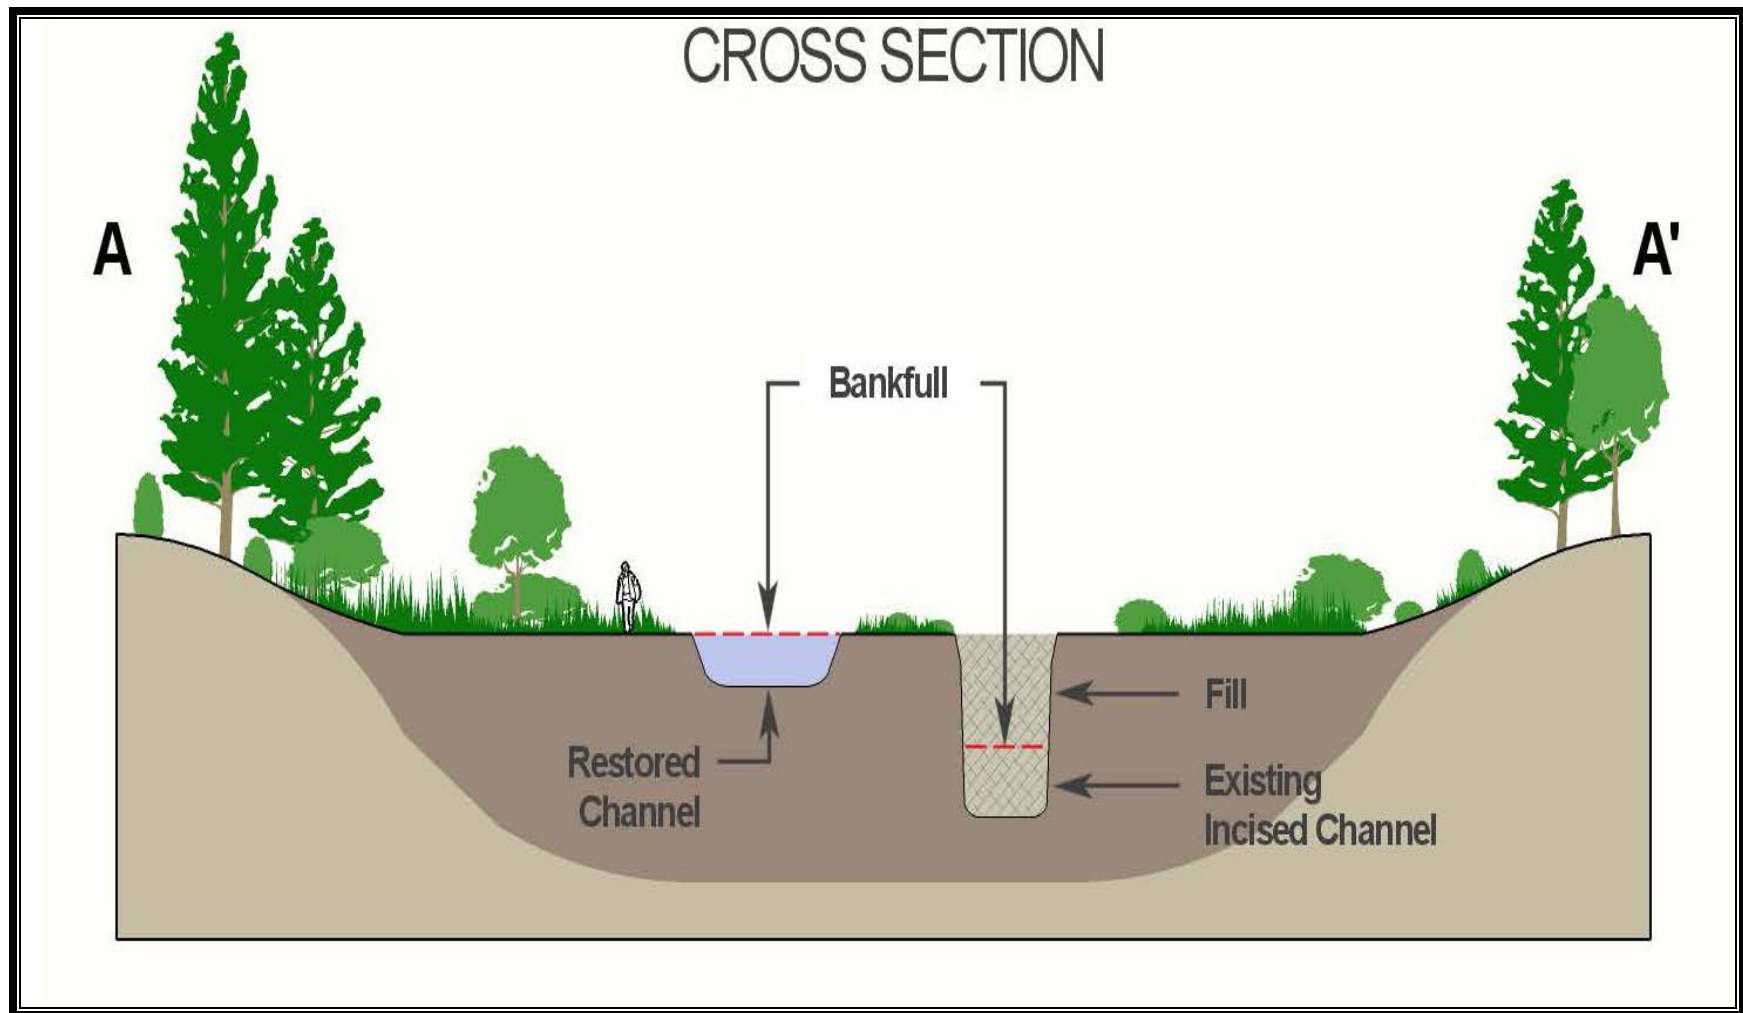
P1-FLOODPLAIN RECONNECTION APPROACH-CROSS SECTION VIEW
